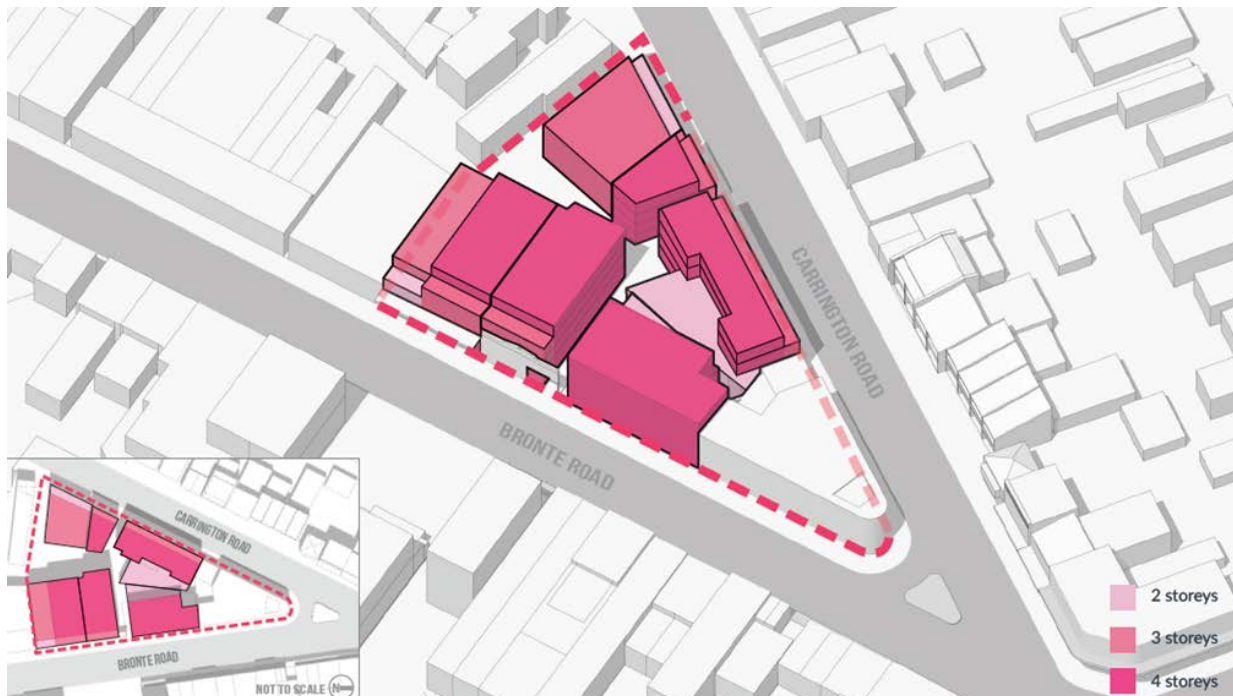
Proposed built form – looking south-west (source: Urban Design Report)
